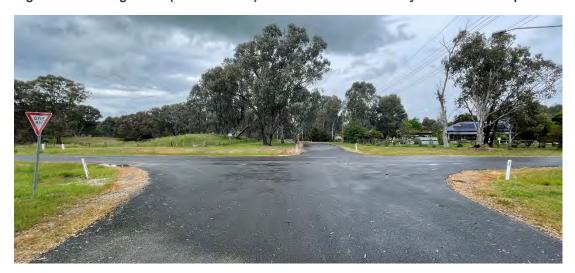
View looking south on Goulburn Street towards the intersection with Adams Street
